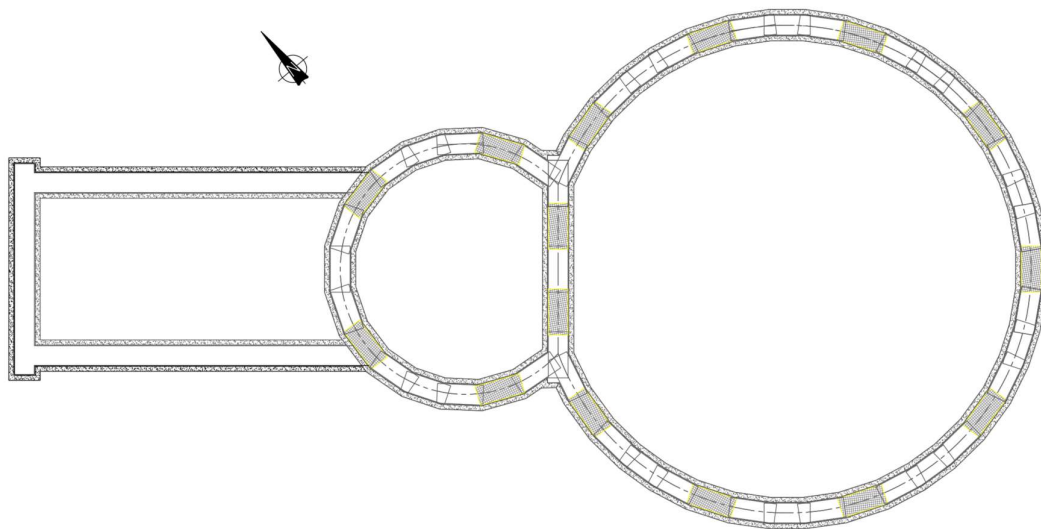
Māngere Pump Station shafts layout showing the temporary support diaphragm wall support and extended confinement box
